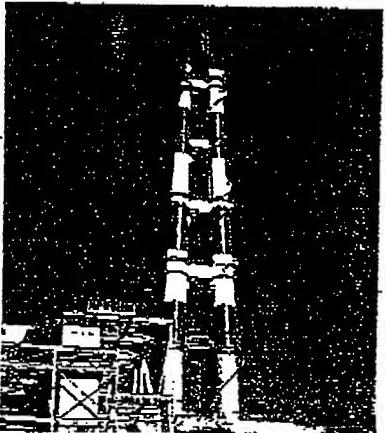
Tokyo Electric Company Chimney, Yokohama Power Station
